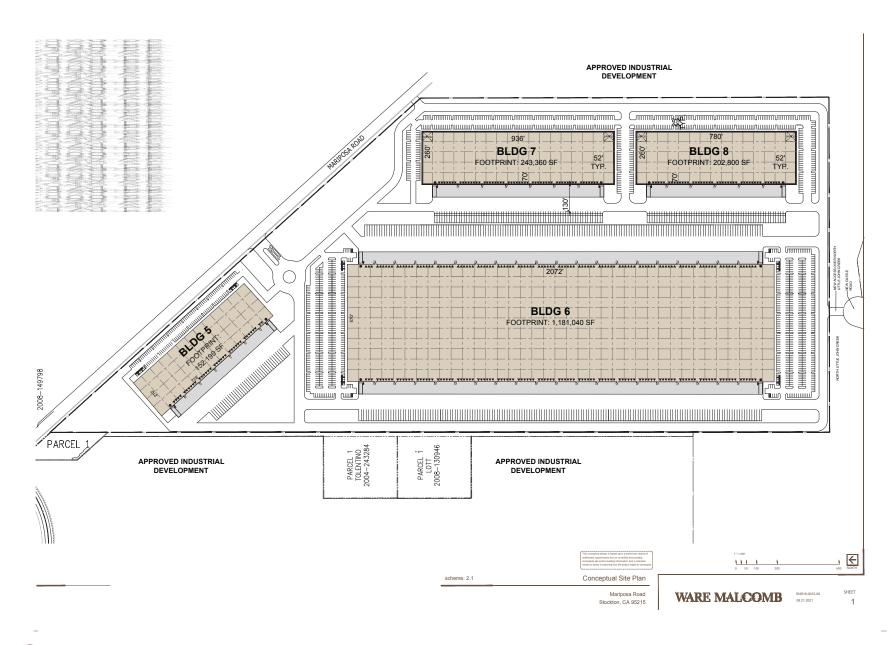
MARIPOSA INDUSTRIAL PARK #2 CONCEPTUAL SITE PLAN
